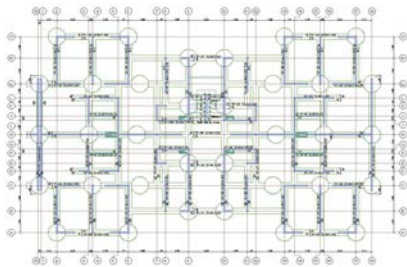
Foundation plan Seven story project. Photo courtesy of Alvaro P
